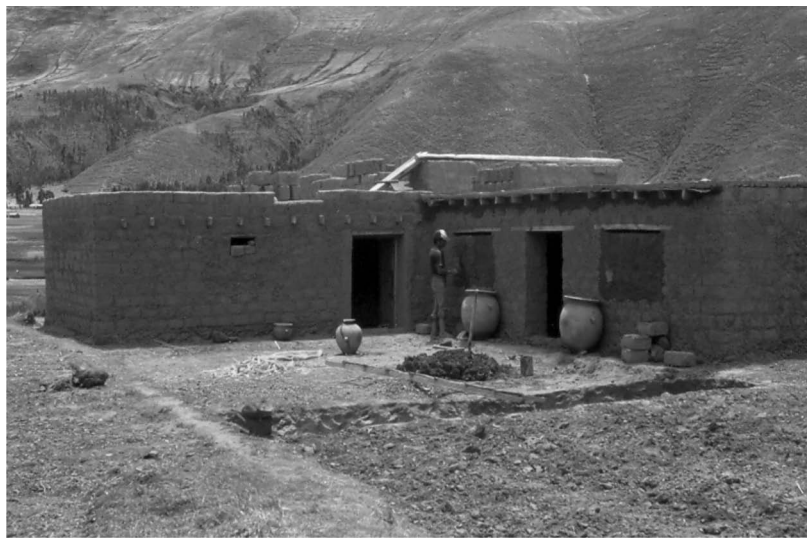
Maximo Amaru during construction work on his house in 1985 (in the process of blocking the window openings with adobe bricks). © Photograph: Bill Sillar.
